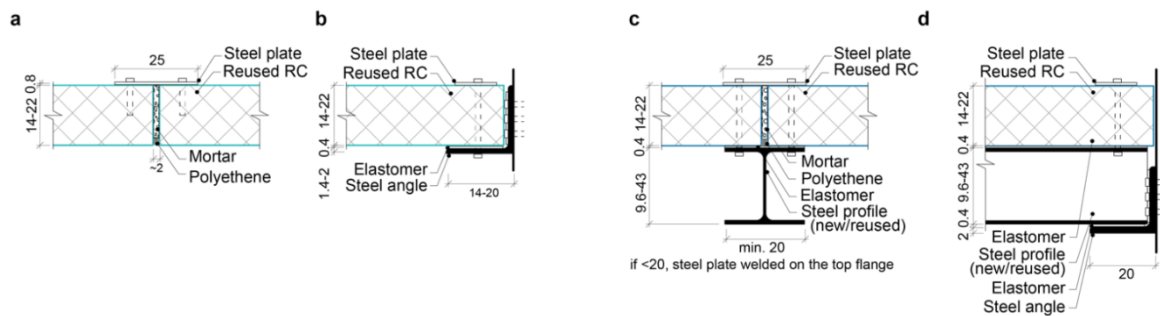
Concept of the reused RC floor systems: RC pieces are cut from existing buildings undergoing demolition and reused as primary (System A) or secondary (System B) elements in new building floors.
